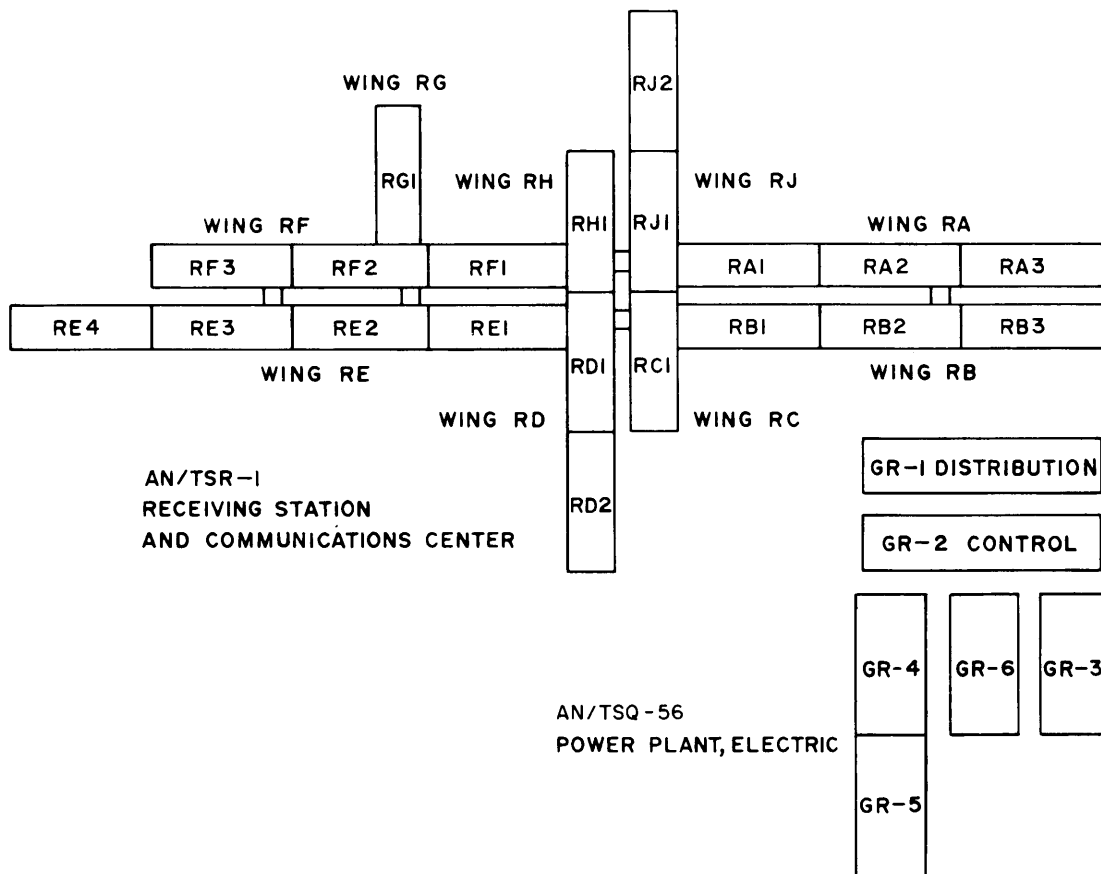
Site Plan, Transportable Communications Center and Receiver Station
